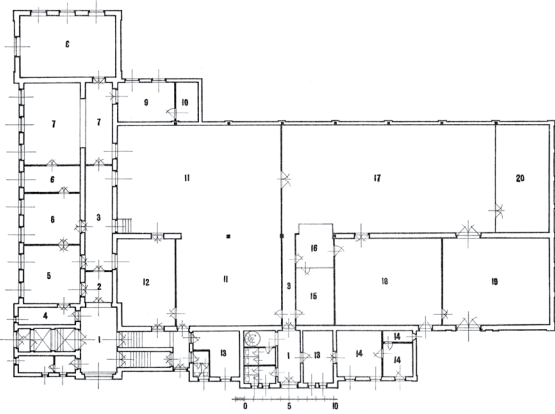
The first floor plan of the Mechanical Technology Building. (After [6, p. 481] [18]) 1. Hall. 2. Ante room. 3. Passage. 4. Servant's quarters. 5. Room of Professor's assistant. 6. Professor's room. 7. Store room. 8. Metal-testing room. 9. Paper-testing room. 10. Dark room. 11. Spinning room. 12. Calendering-room. 13. Cloak room and lavatory for use of students. 14. Servant's quarters. 15. Storage of tools. 16. Foreman's quarters. 17. Mechanical workshop. 18. Smithy. 19. Foundry. 20. Joiner's workshop.
